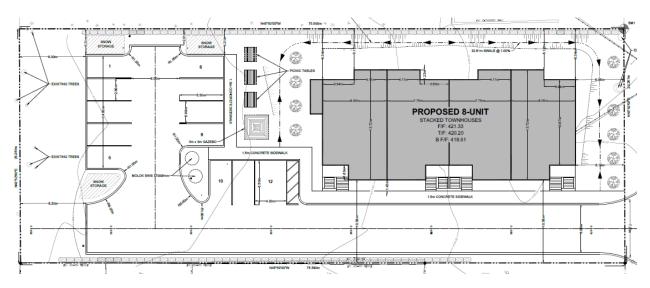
Site plan submitted by Cobide Engineering, March 2023
